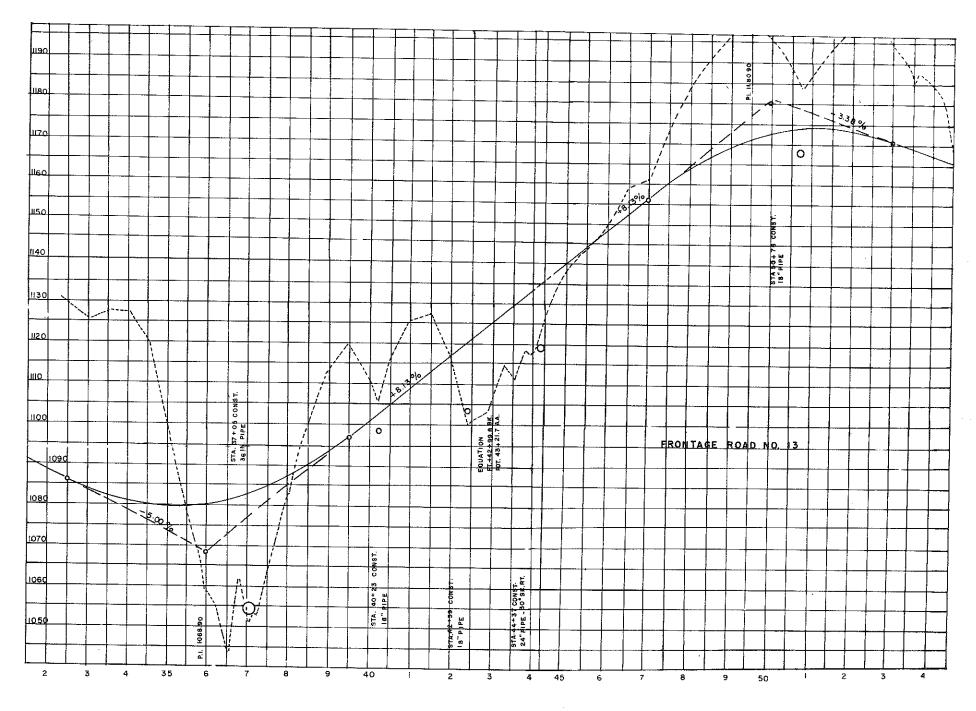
Profile of Frontage Road 13 Adjacent to I 75, Department v. Watson.
